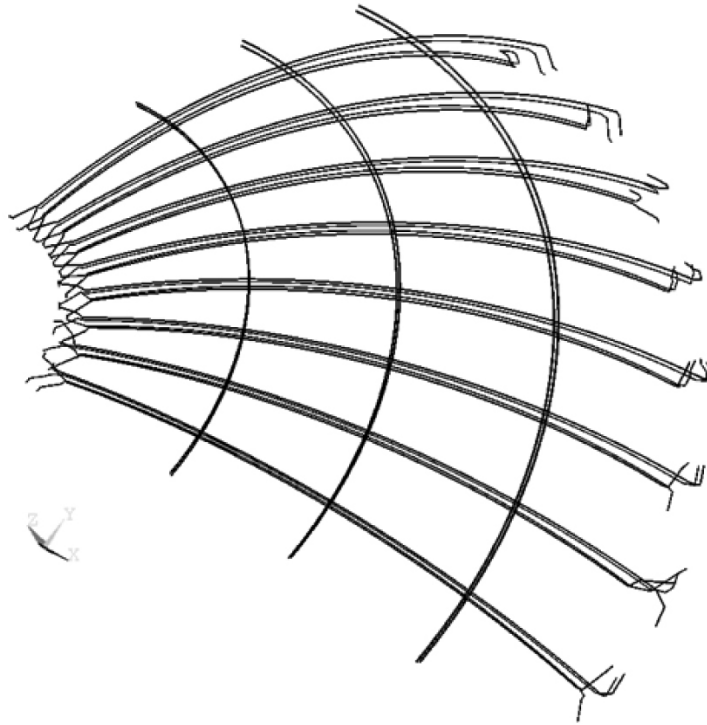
Reinforcement of circumferential beams and ribs including the anchorage zone.
